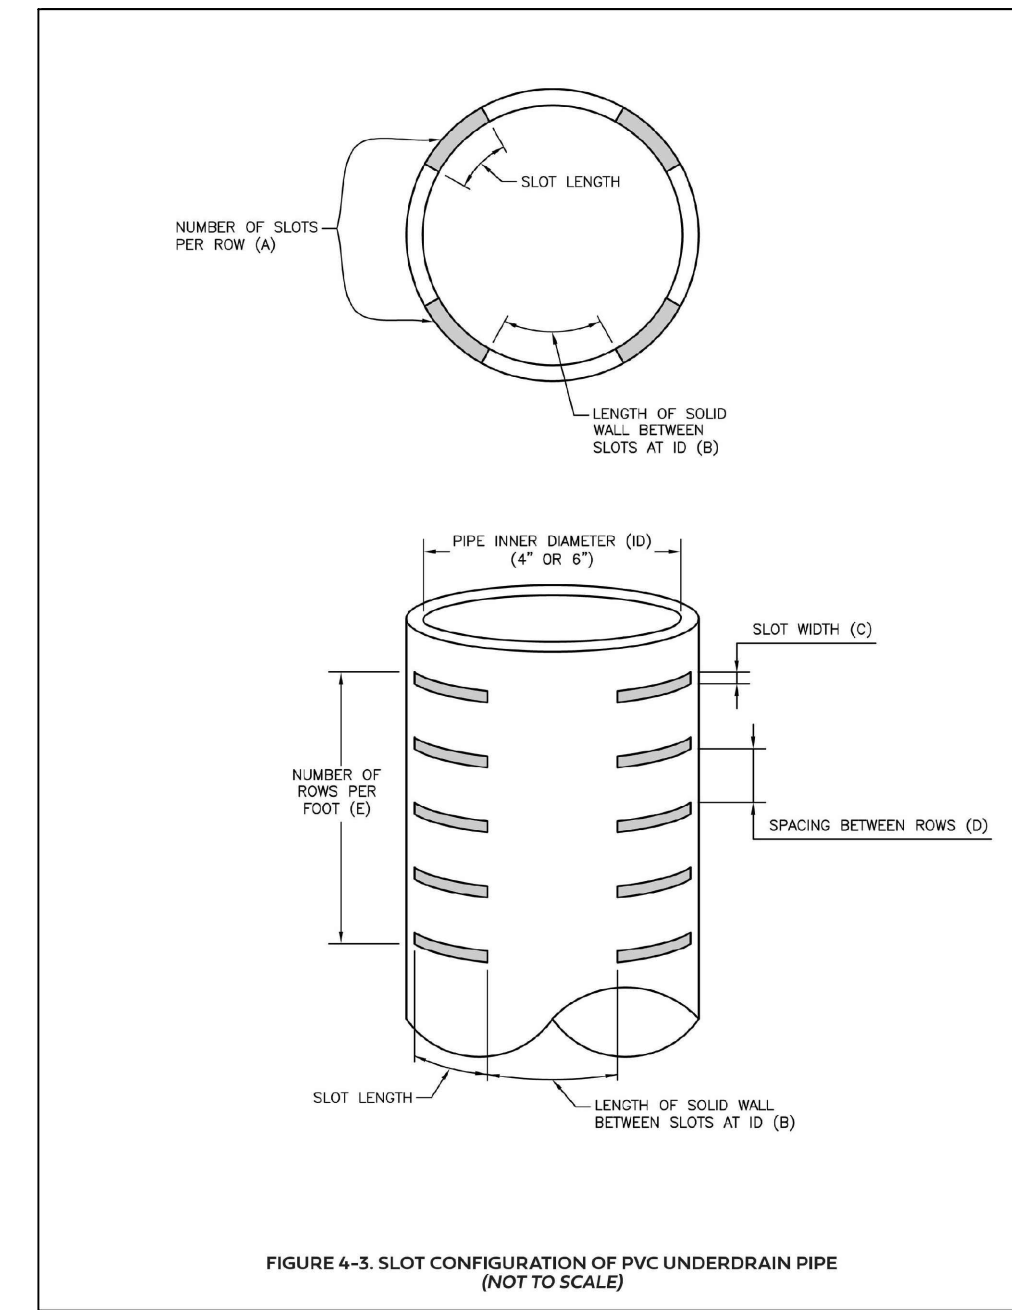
SLOT CONFIGURATION OF PVC UNDERDRAIN PIPE (NOT TO SCALE)
